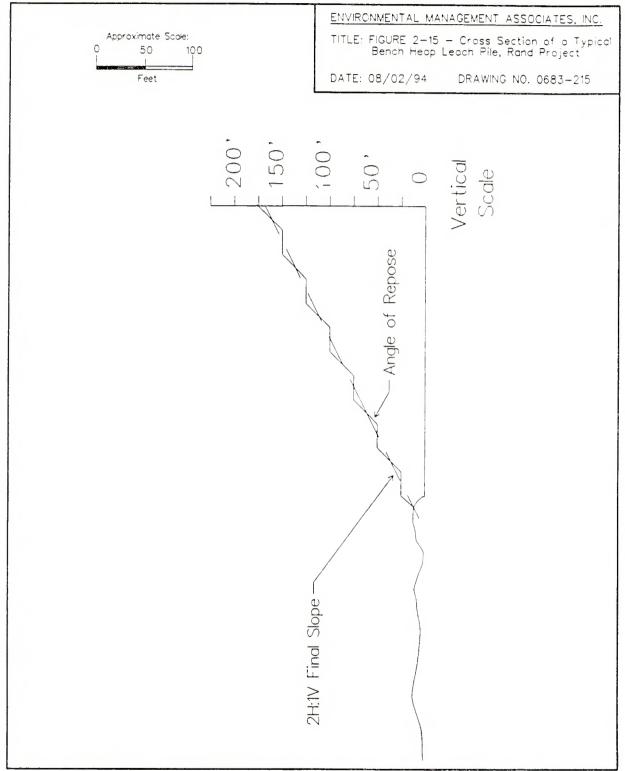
Cross Section of a Typical Bench Heap Leach Pile, Rand Project
